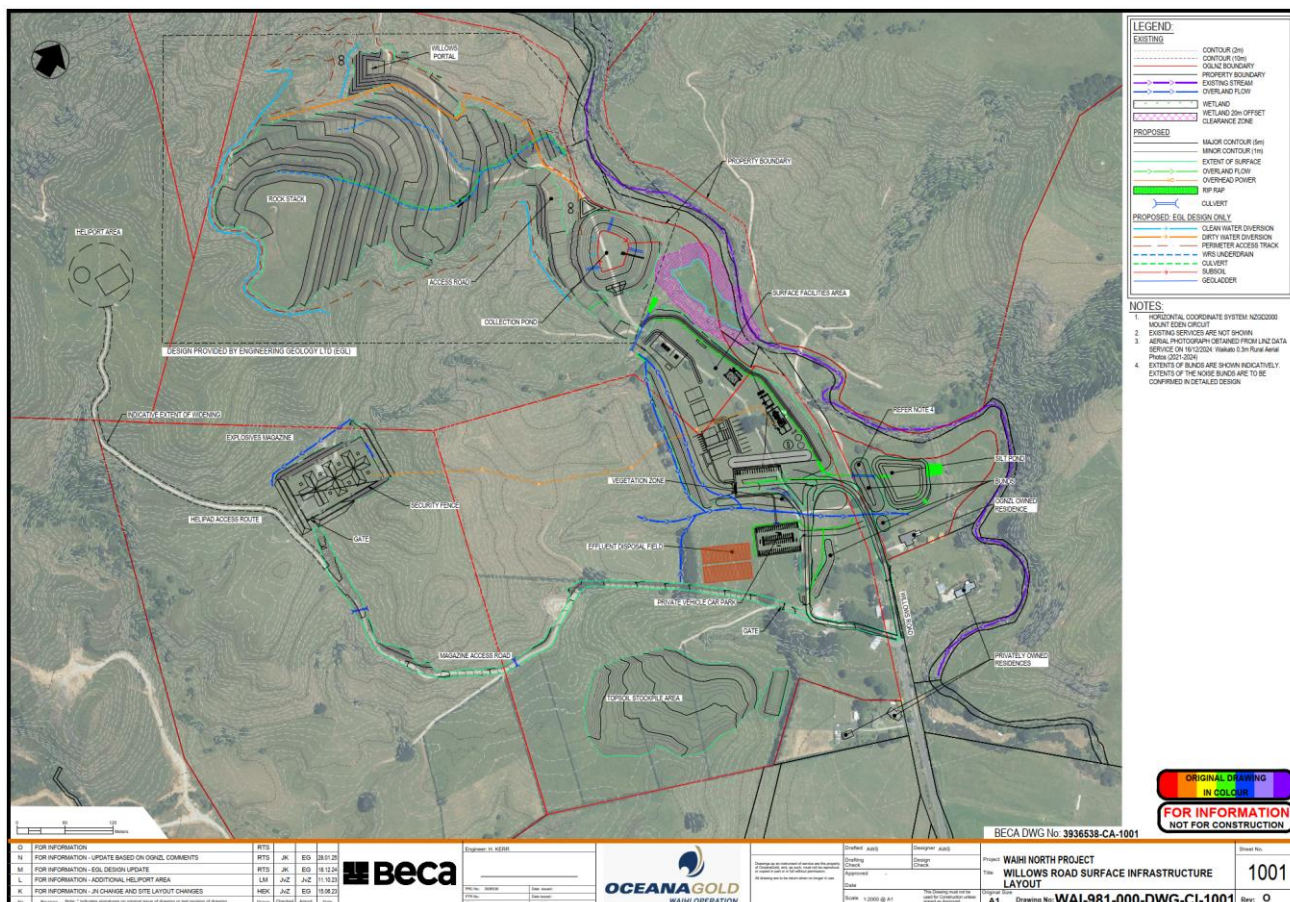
Willows Road Surface Facilities Area General Arrangements (Source: BECA).
